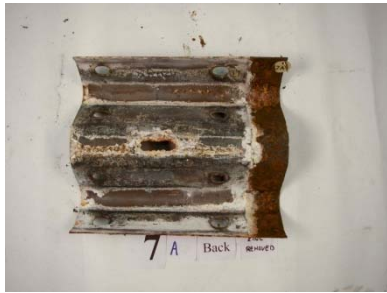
Part A WSGR with Zinc Foil Insert Disassembled Joint
